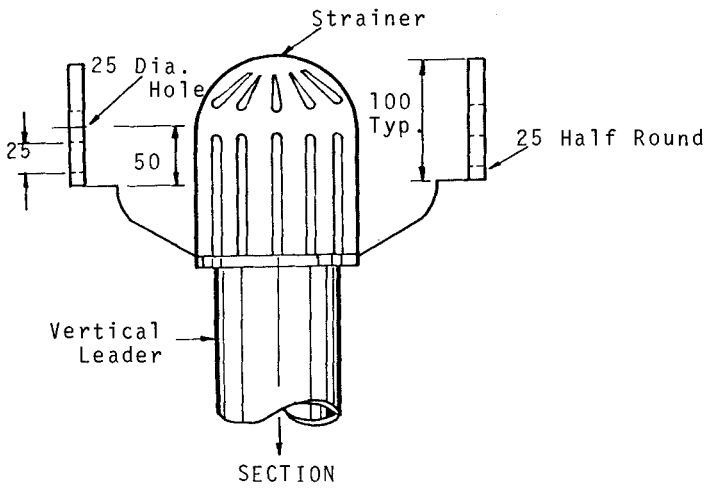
Rainfall Detention Ponding Ring for Flat Roofs
